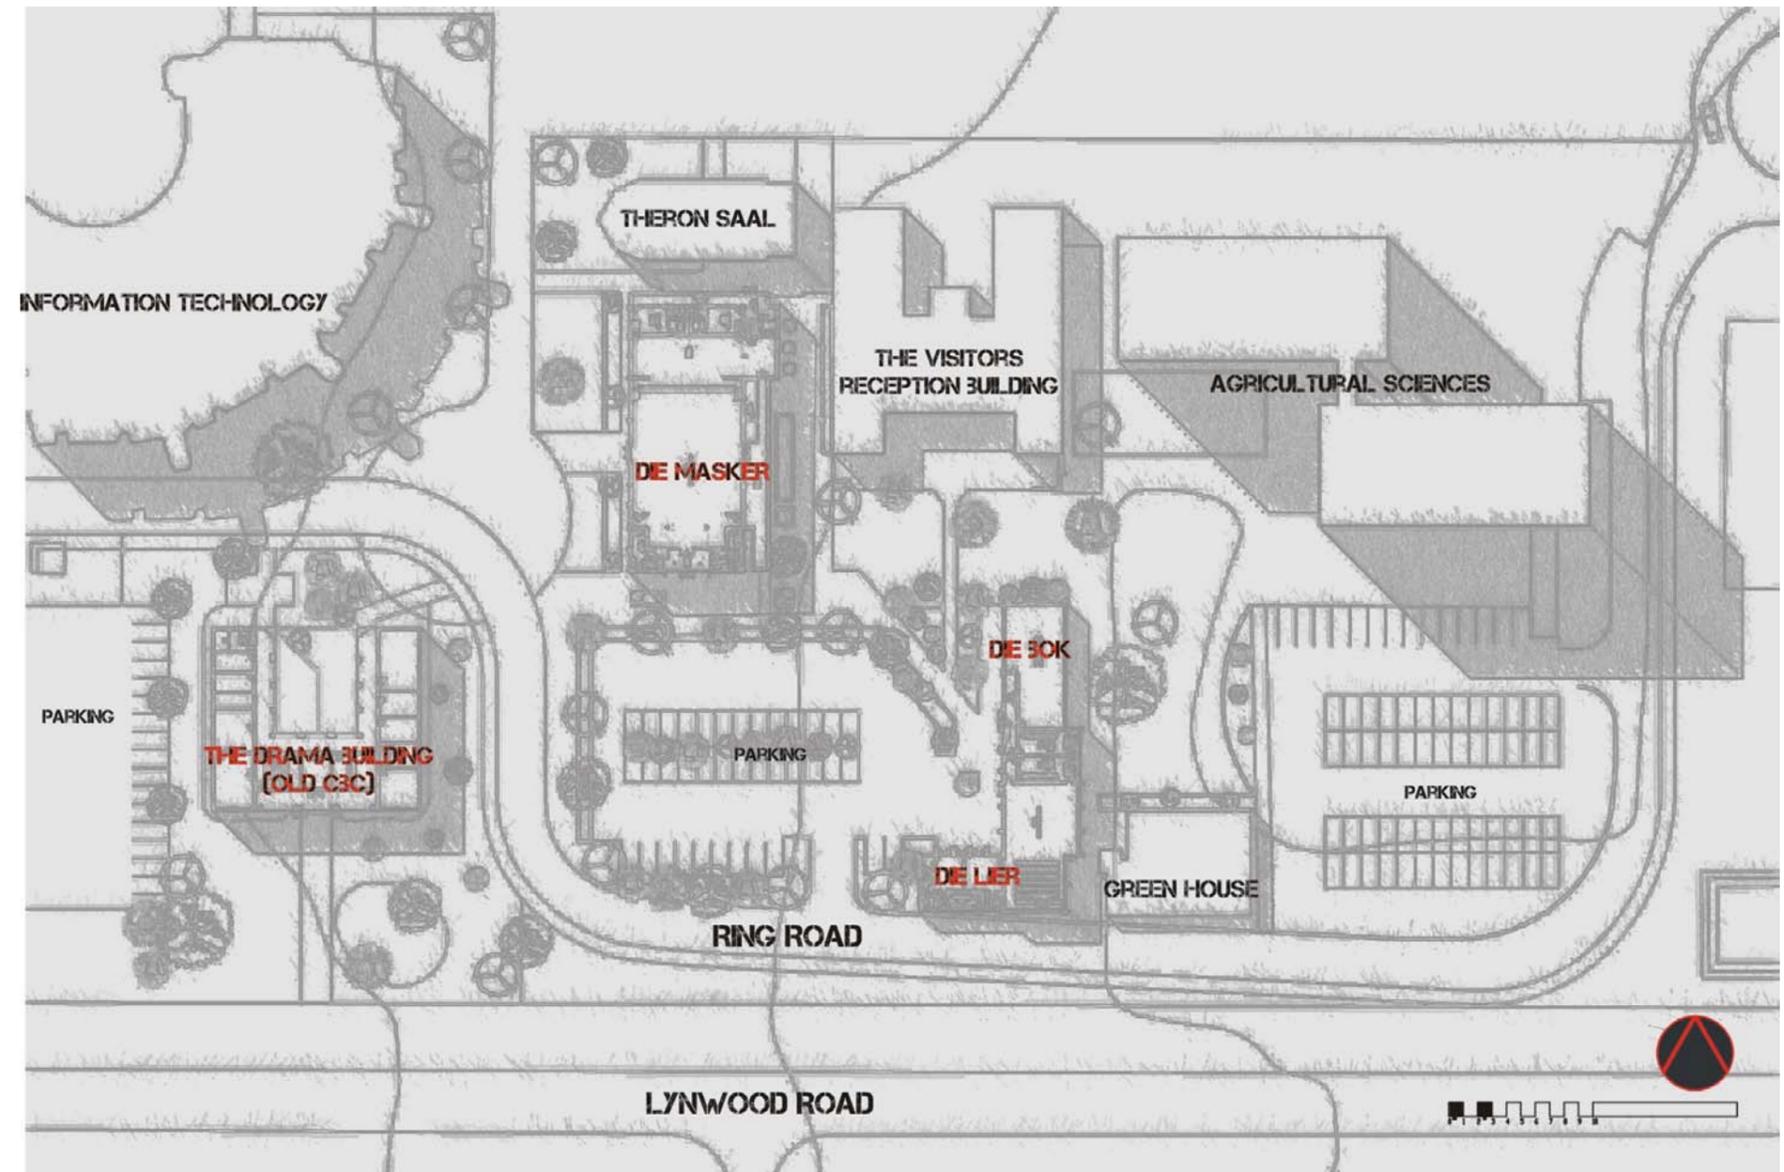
Existing Site plan of the Proposed Drama Precinct
